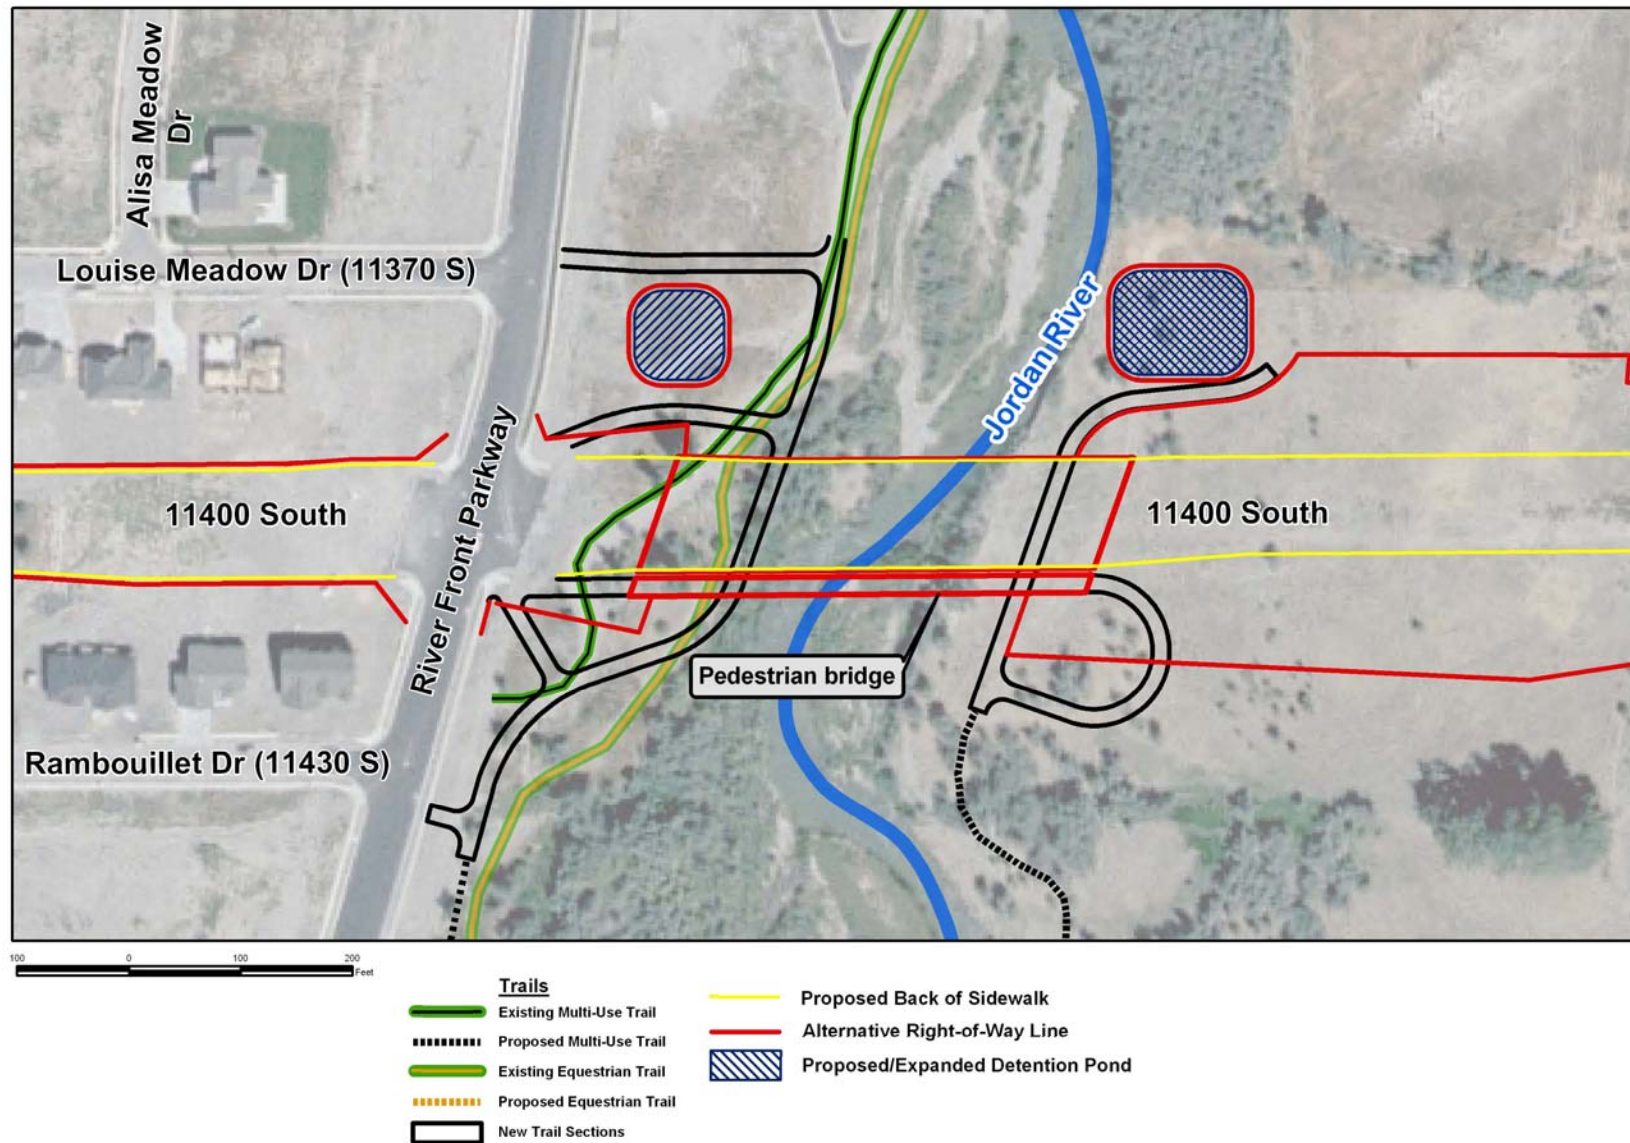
Conceptual Parkway Trail Connections at 11400 South
